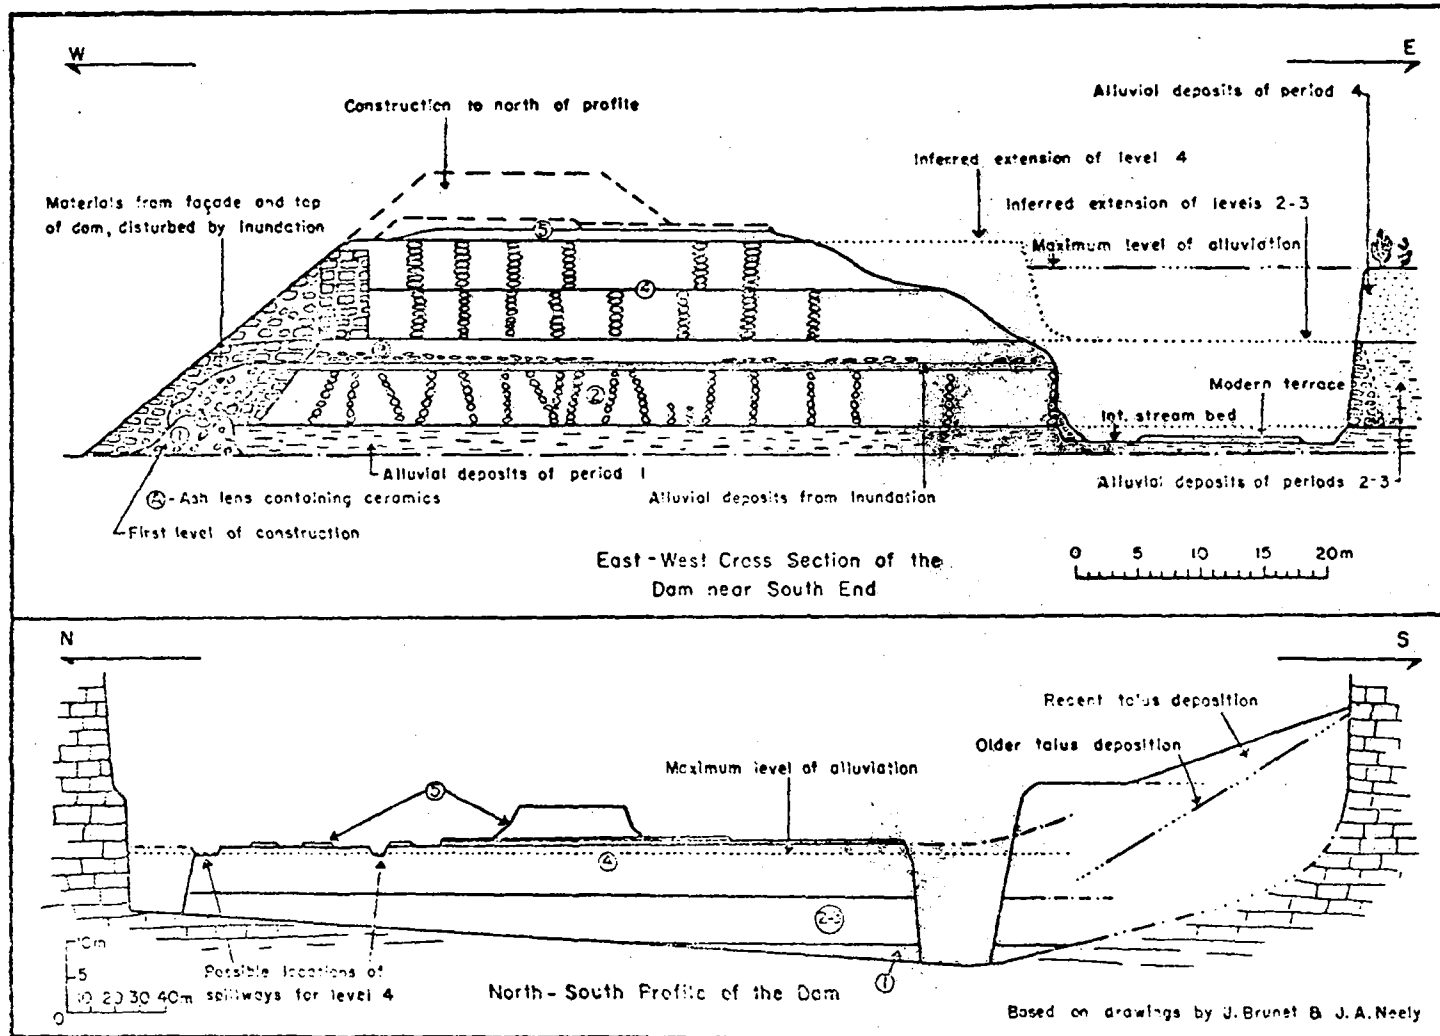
Longitudinal and Transverse Section of the Purron Dam
